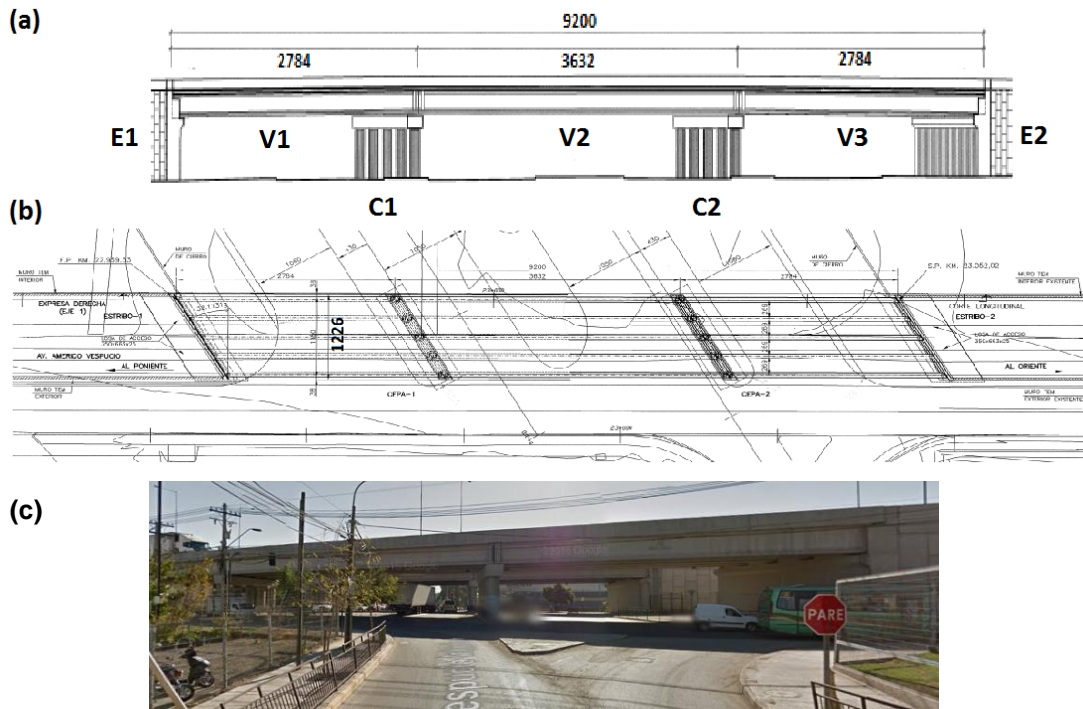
Lo Echevers overpass (a) elevation view - units in cm, (b) plan view, (c) photo.
